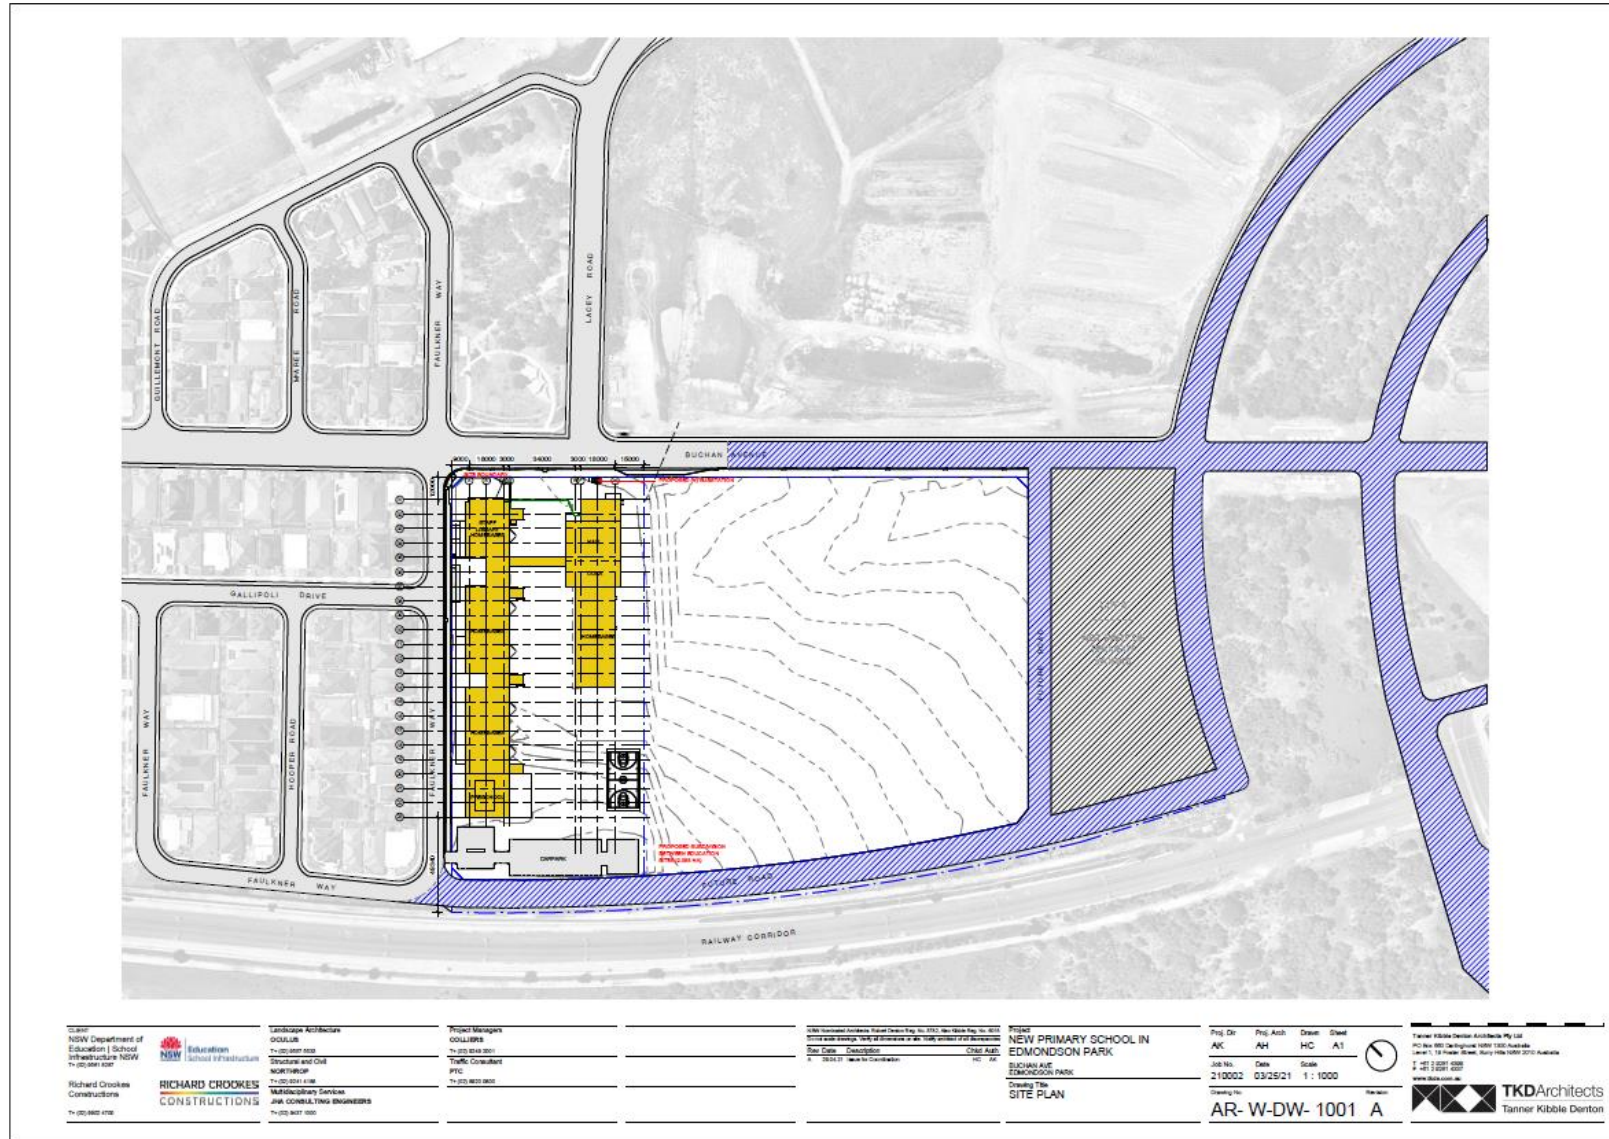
Prospective Site Layout (TKD Architects, 2021)
